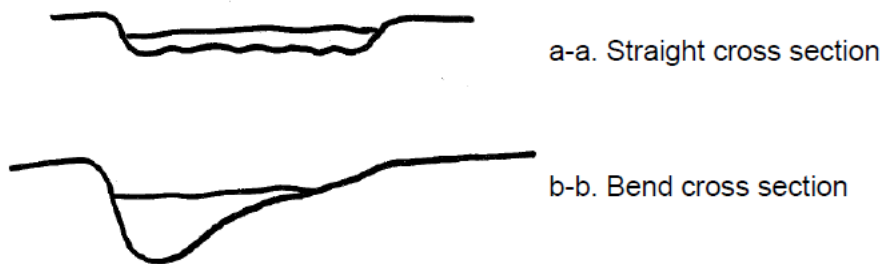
Example cross sections for plane- riffle channels
